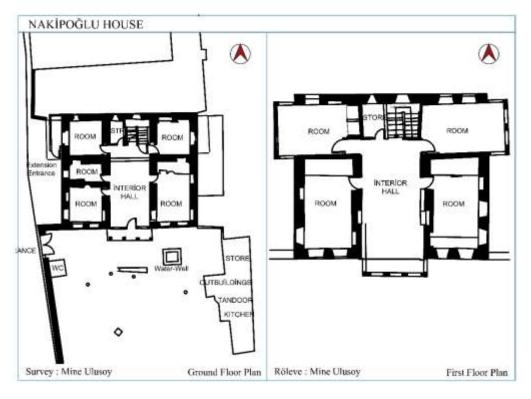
Ground and First Floor Plan of Nakipoğlu House (Dönmez, 2017)
